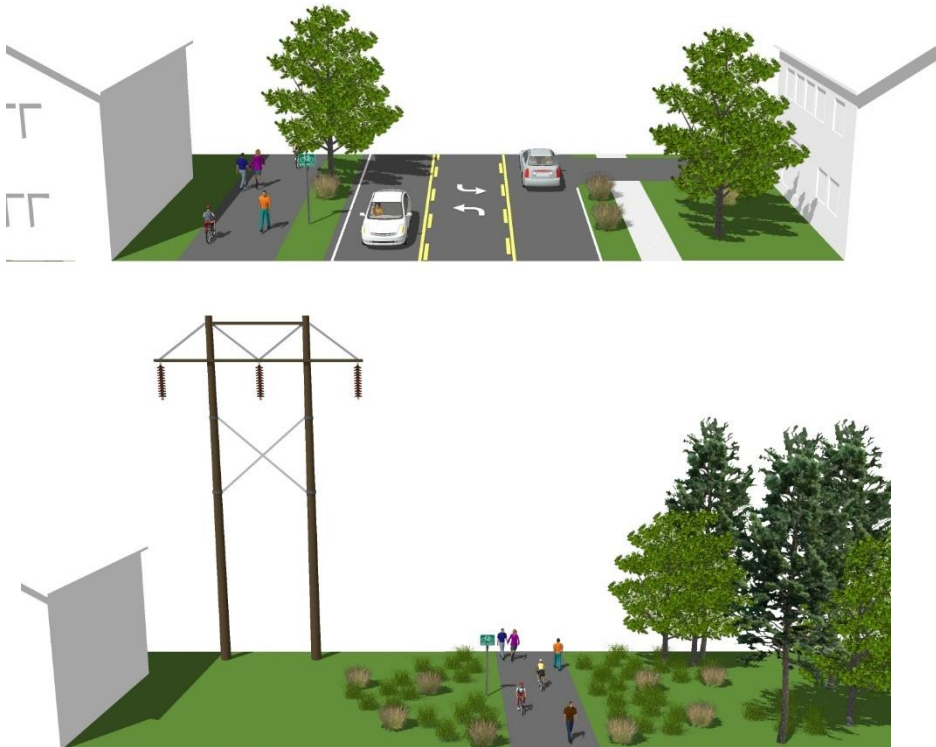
Typical Cross Sections (Segments 7, 8, and 9)
